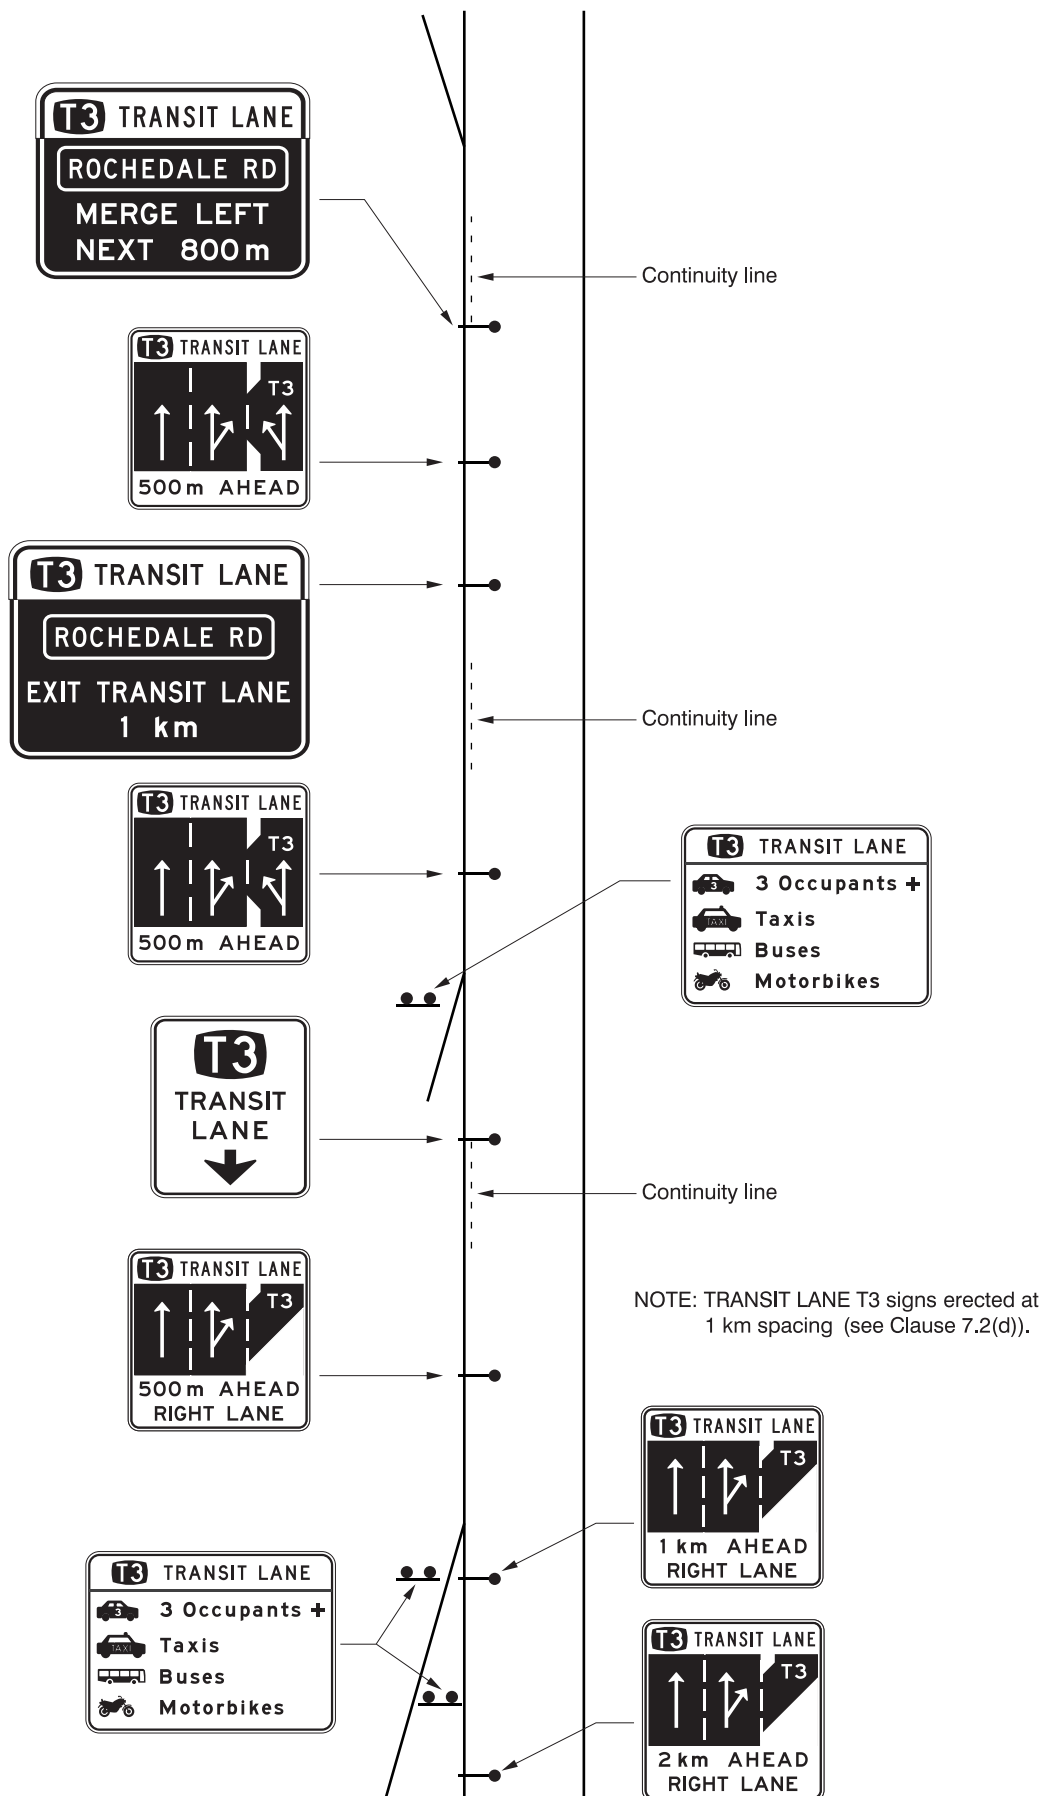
TYPICAL ARRANGEMENT FOR FREEWAY TRANSIT LANE
